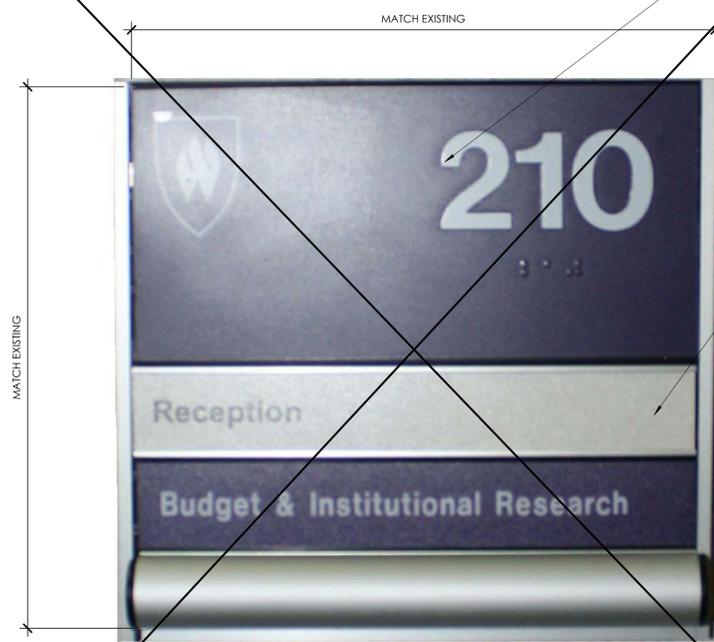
PHOTO OF EXISTING SIGN FOR MATCHING EXISTING
